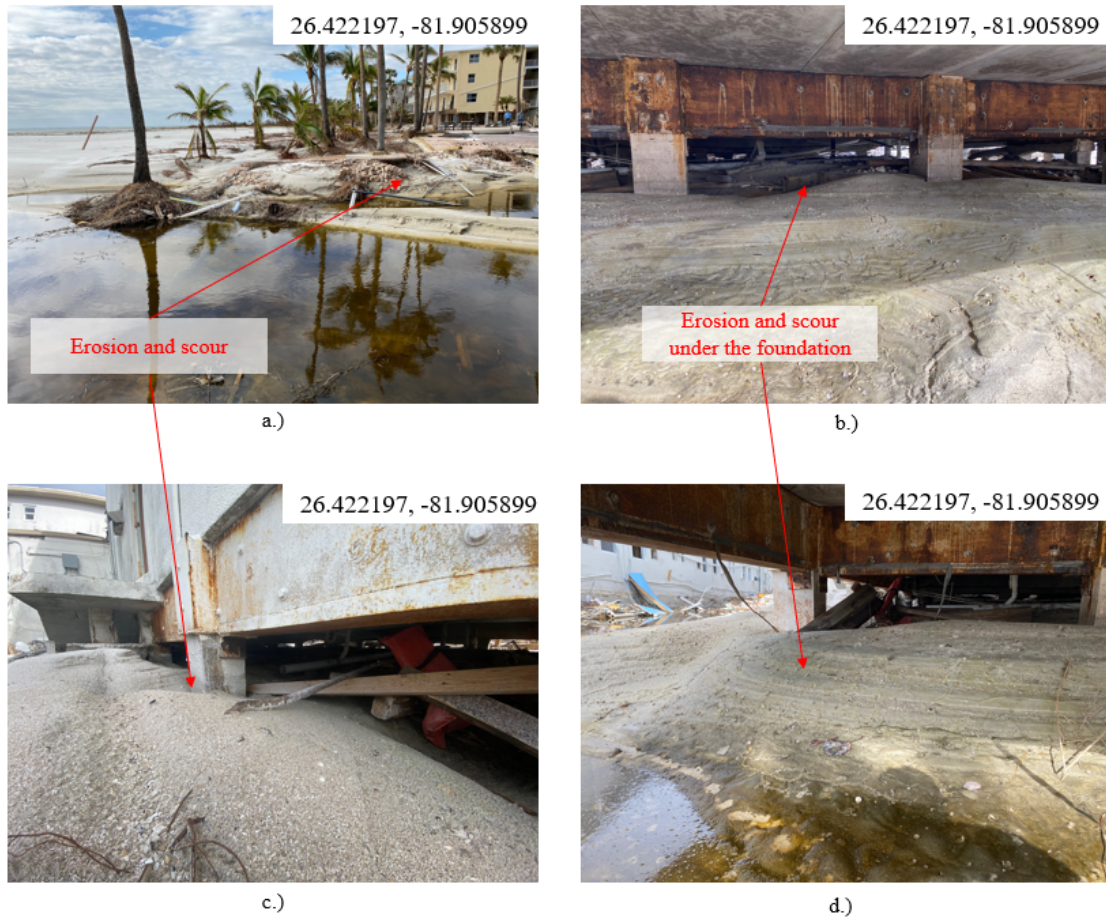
Ground images of failures observed in south east end of the Fort Myers Beach island, near Sunset Condominium: (a) erosion and scour underneath the foundation of the house; (b) closer look below the foundation showing extreme erosion and sediment transport; (c) exposed footing due to extreme erosion; (d) sediment transport below the foundation of the house
